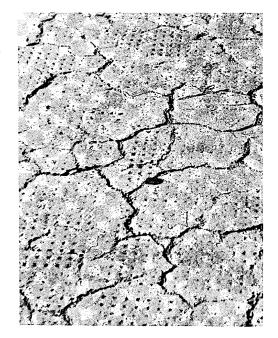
Typical pattern cracking in sidewalk in Kingston.
